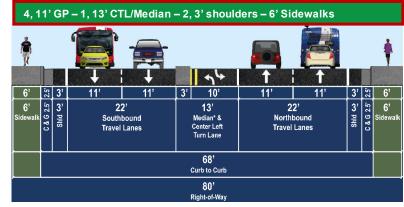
Short-Term Recommended Alternative: Route 66 to Beaver Street
